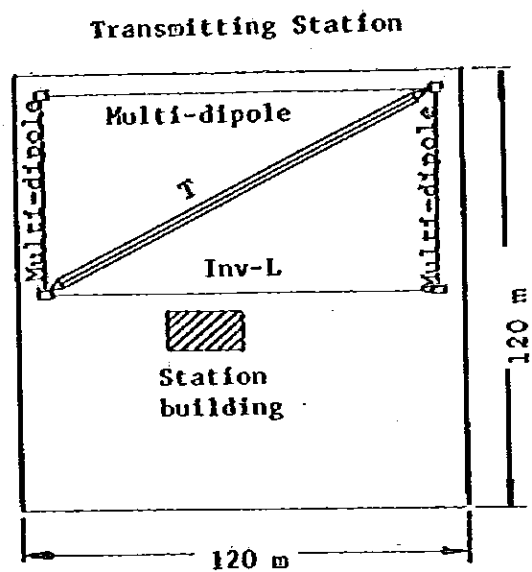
(2) Typical Site Layout for Class B Station
